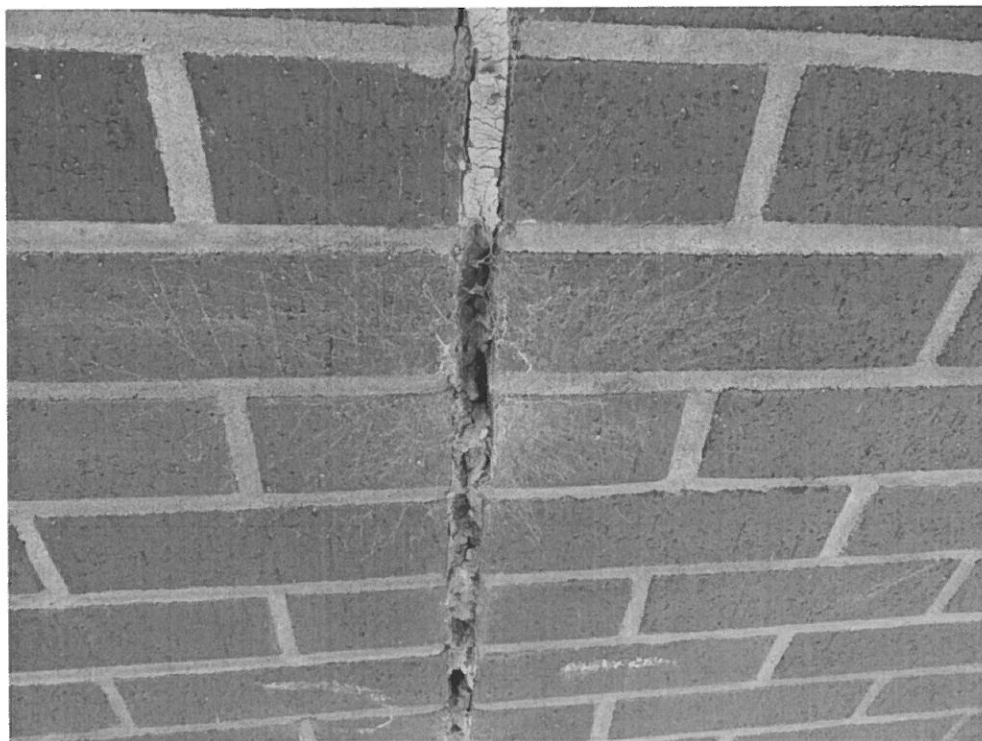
, shows deteriorated sealant and backer rod at brick veneer control joints (typical on both schools)
